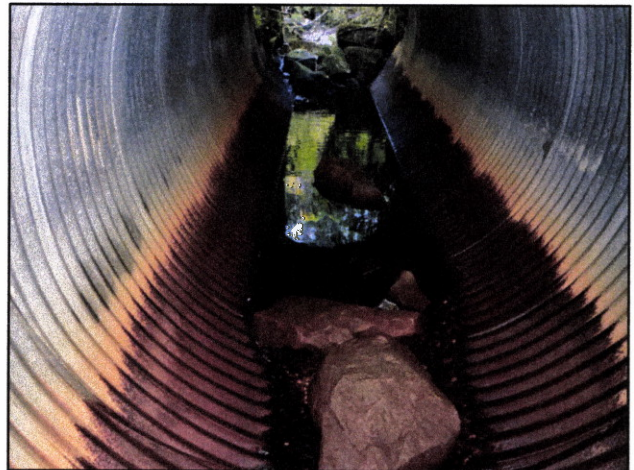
Inlet of culvert with fallen rip rap blocking the channel and fish passage at waypoint 1000.
